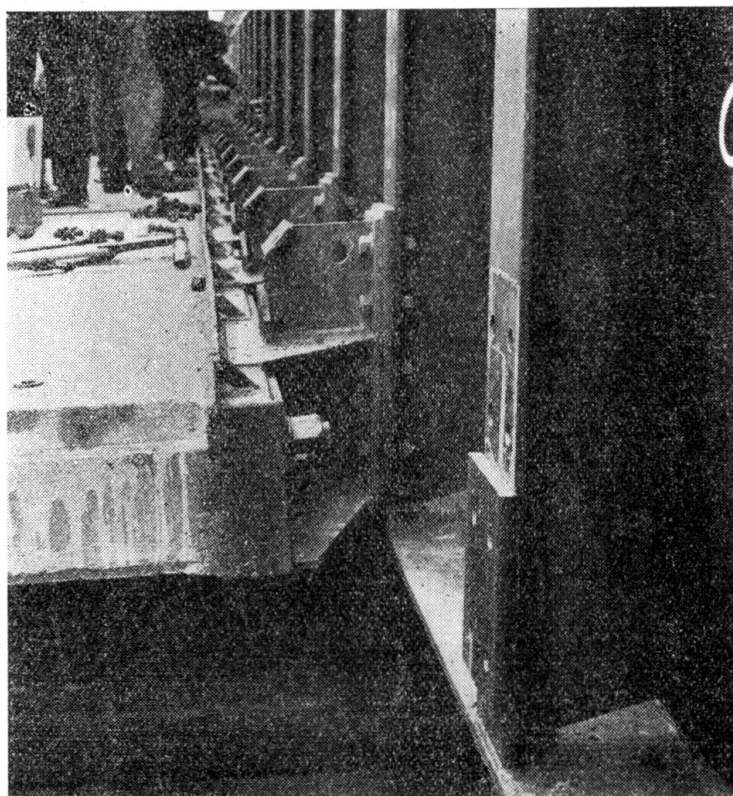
The bolted connection between deck units (in this case they are of precast prestressed concrete) and the main girders of a half-through type span
